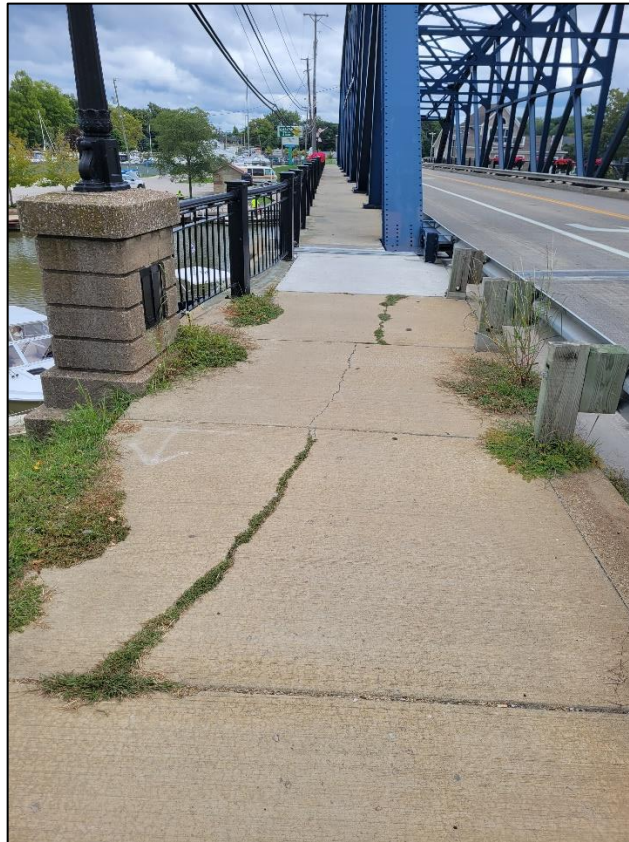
Erosion at northeast embankment is beneath sidewalk.
